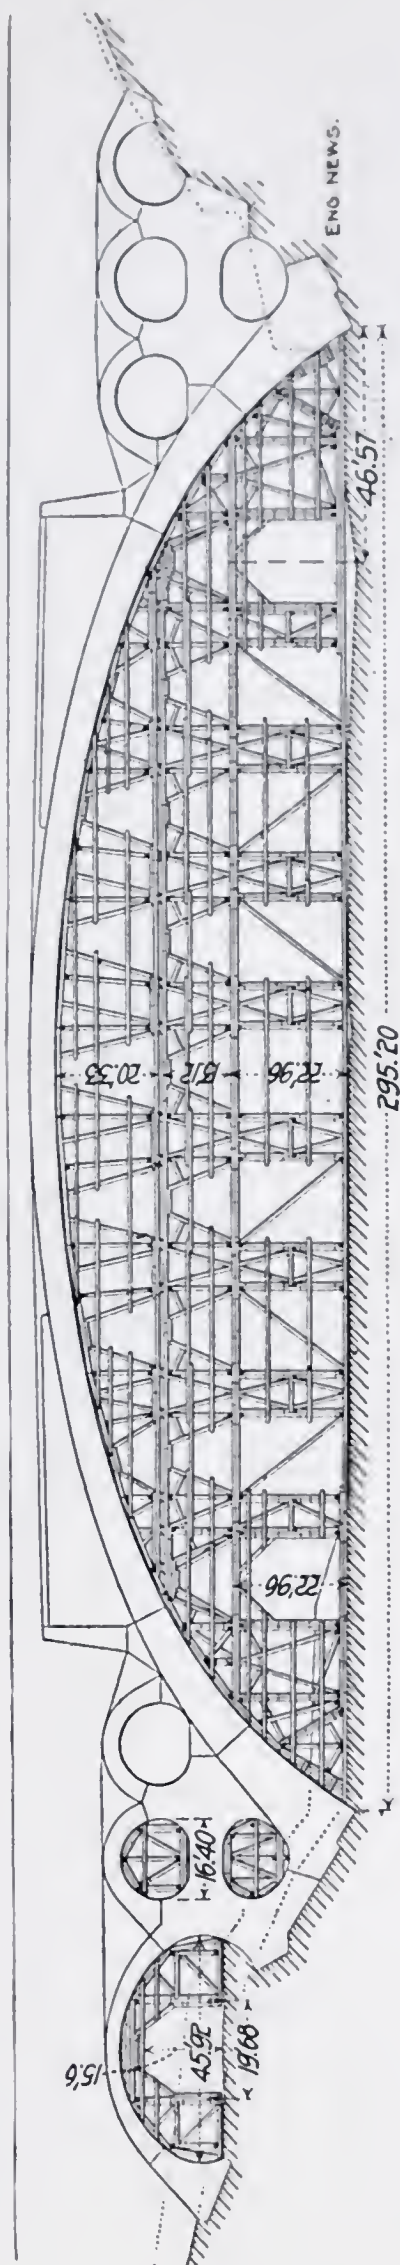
CENTERING FOR THE PLATON STONE ARCH BRIDGE.
